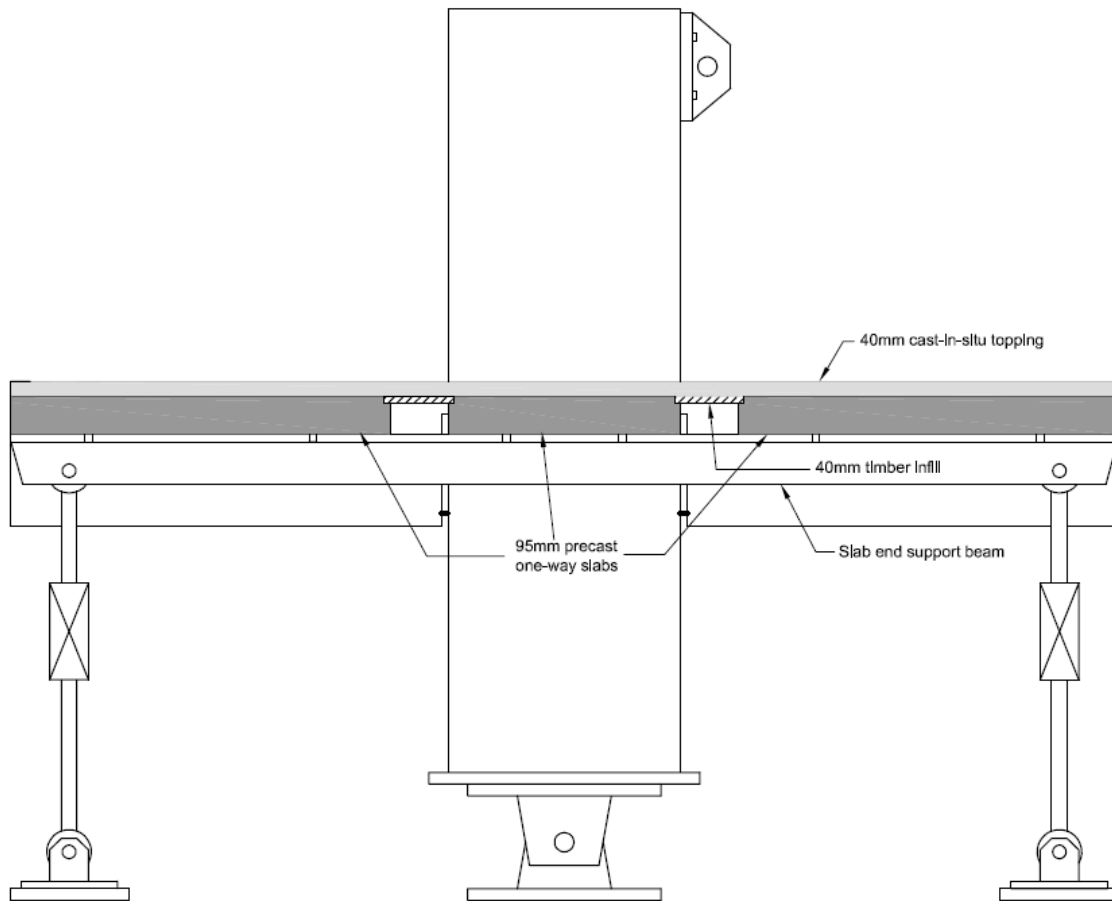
Specimen SB3 with floor slab – End elevation of floor slab
